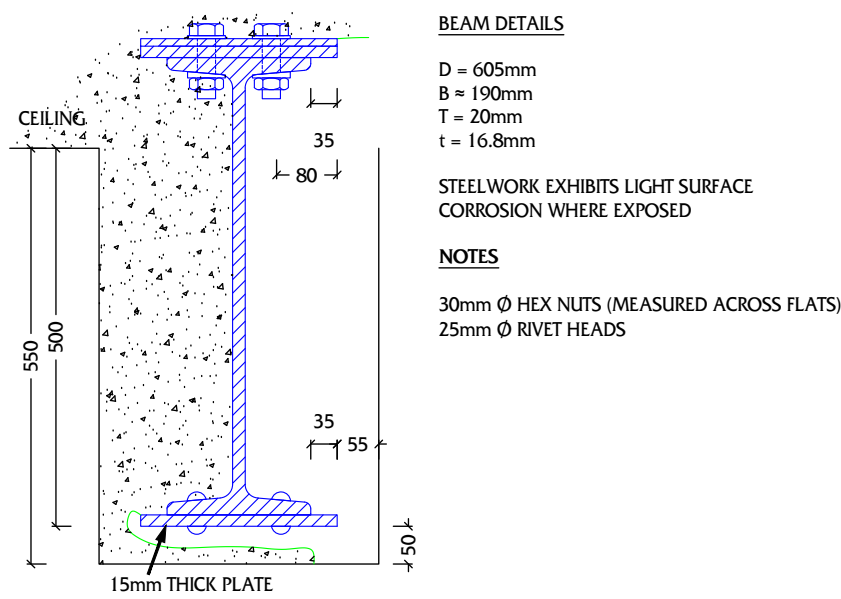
PART SECTION LOOKING NORTH THROUGH TRANSFER BEAM - SURVEY AREA J-K/3 SCALE 1:10
